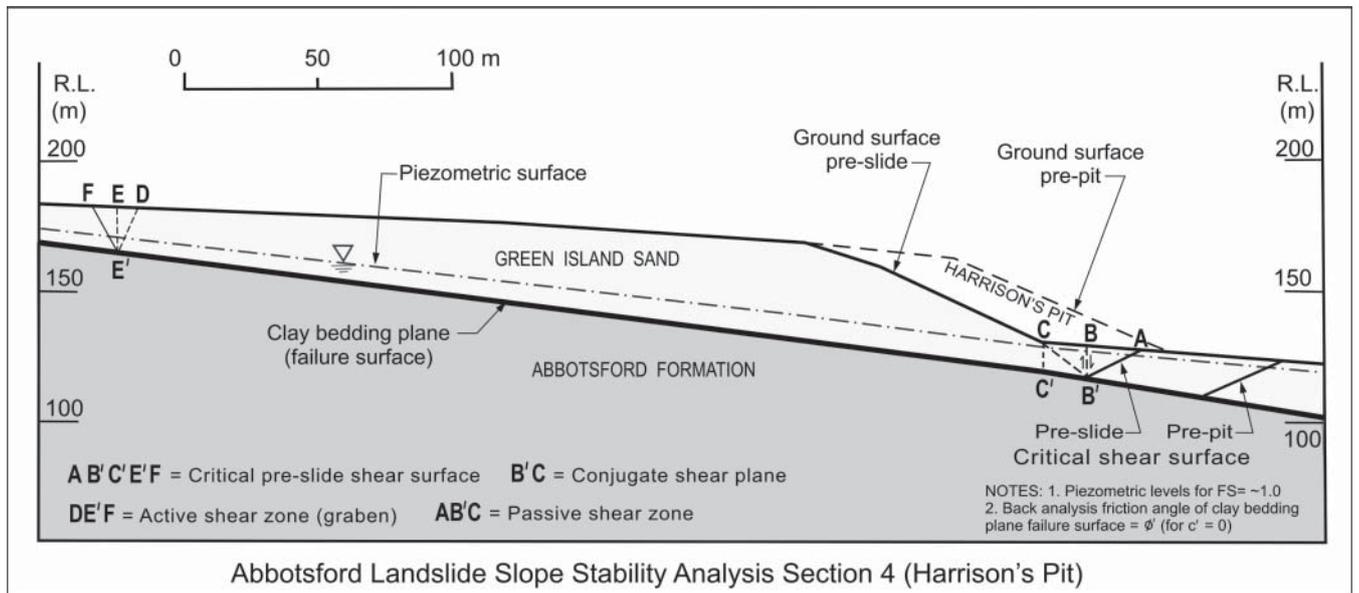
Cross Section 4 through Harrison's Pit showing details of the model used for the stability analysis.
